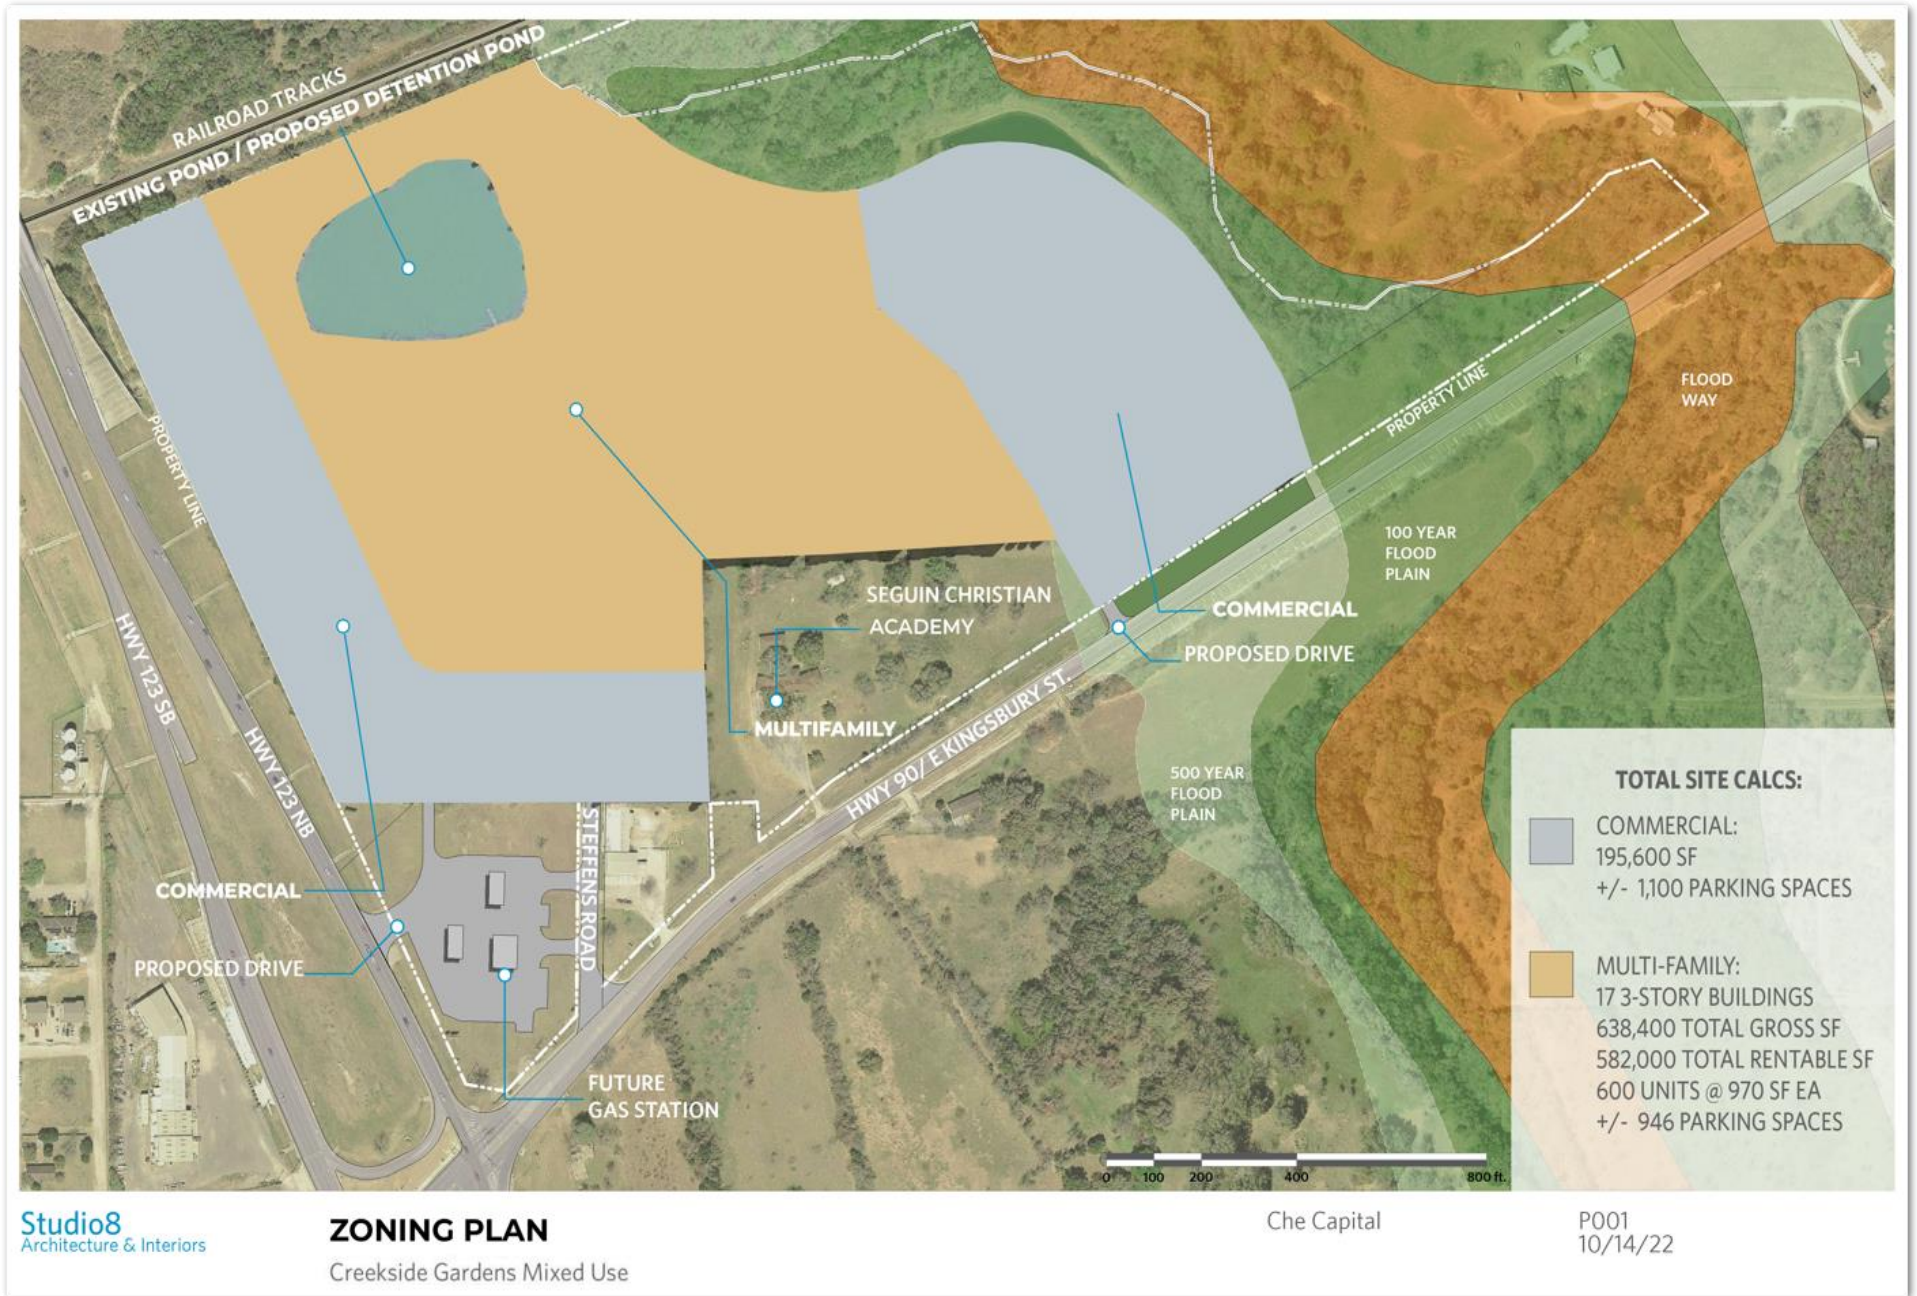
Exhibit B: Conceptual Site Plan (Preliminary and subject to change)
